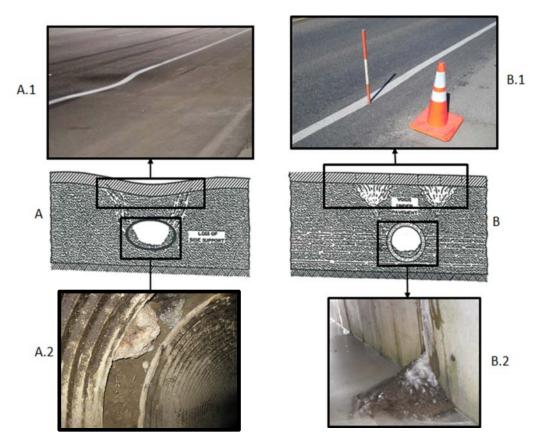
(A) Backfill Loss Beneath Pavement Causing Sag in the Approach Roadway (A.1). (B) Large Void Beneath Pavement Due to Backfill Loss, Discovered by Probing Small Hole (B.1). These distress indicators should alert the inspector to check for evidence of backfill infiltration inside barrel (A.2 and B.2)
